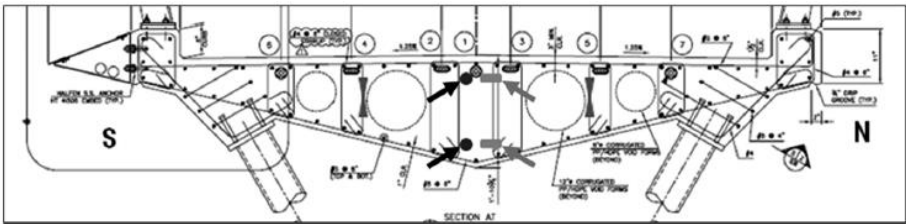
Position of sensors in the cross-section of pedestrian bridge – Black arrows point to discrete sensors and grey arrows to distributed sensors, [22]
